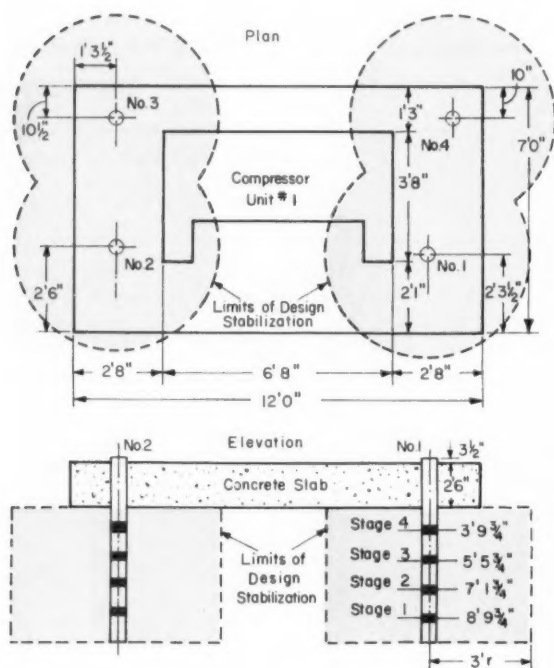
Plan and profile views show limits of proposed soil stabilization under compressor foundation.
